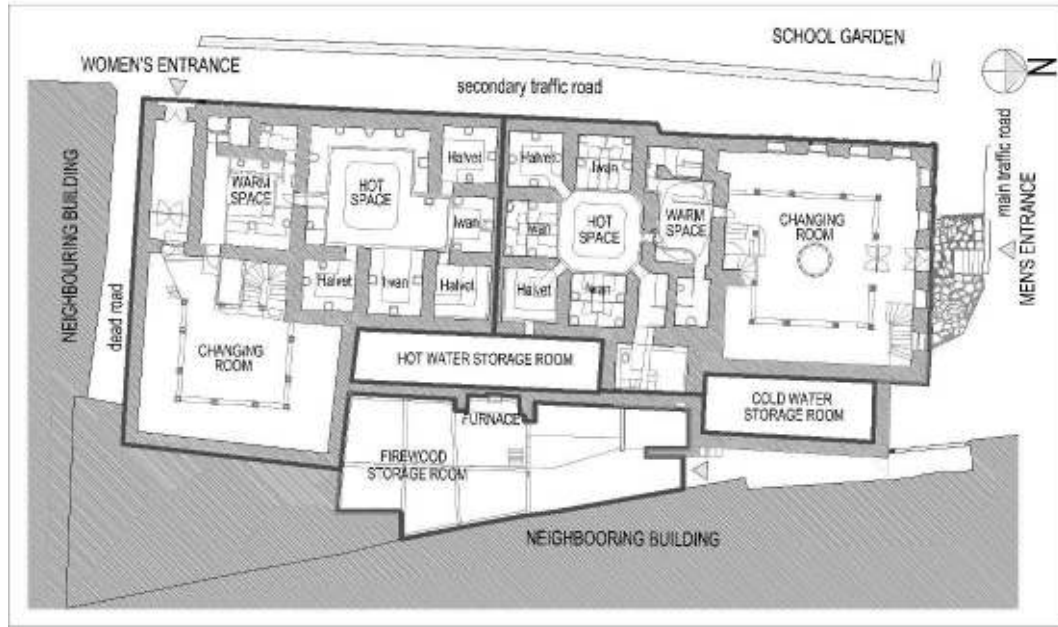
Plan of Şengül Hamamı showing sections for the women's and men's parts and service spaces (Source: Archives of the General Directorate of Pious Foundations, 2008)
